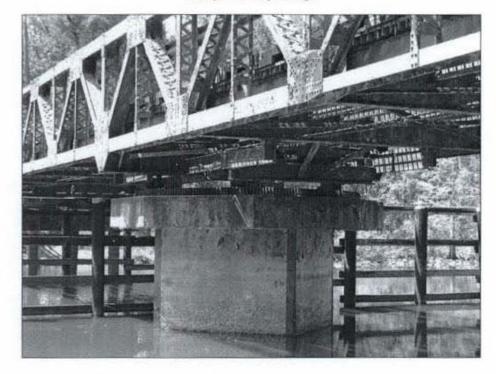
Roll 2702-1, Exp. 5; Steel Grate Deck, Facing Southwest
